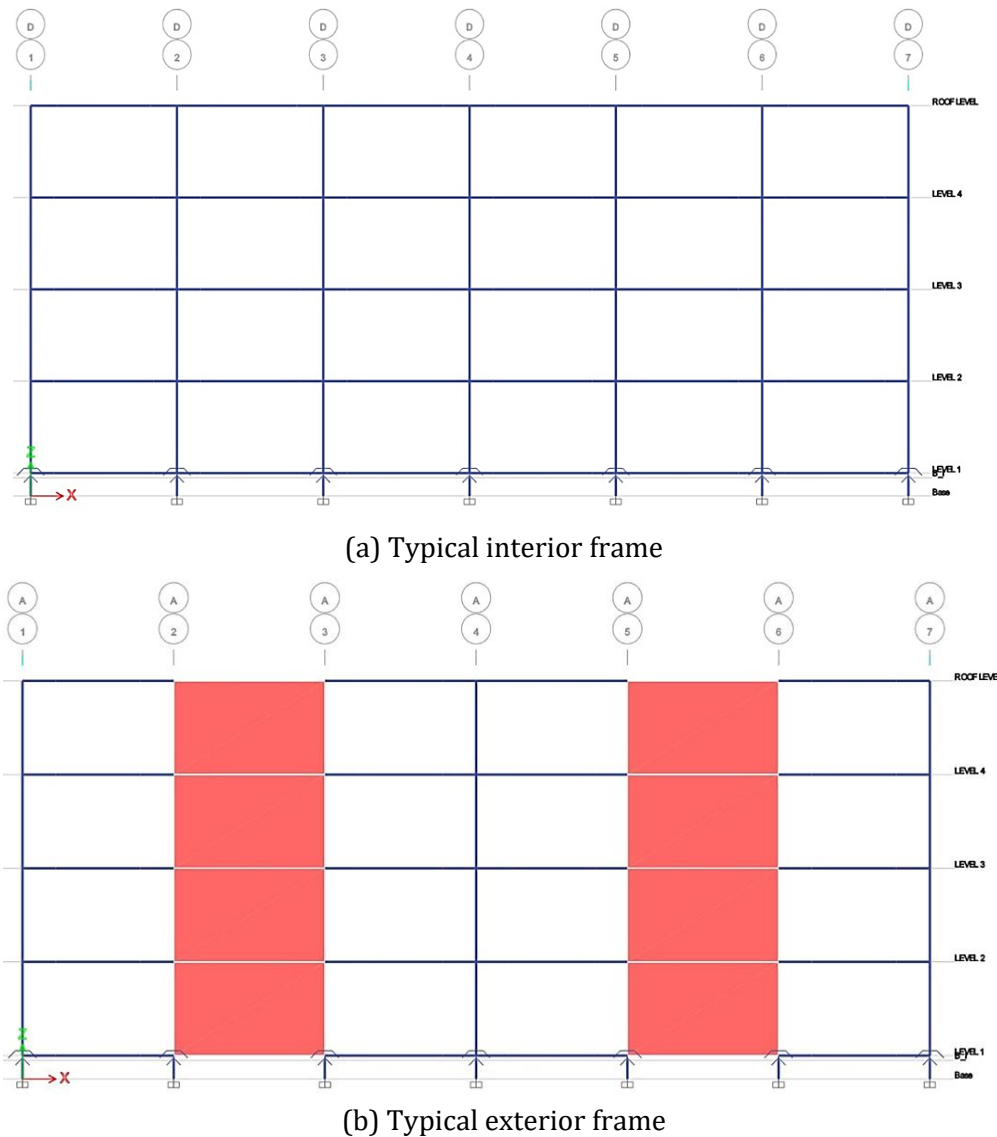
Typical building elevation views of Model 3 (base-isolated structure): (a) interior frame; (b) exterior frame
